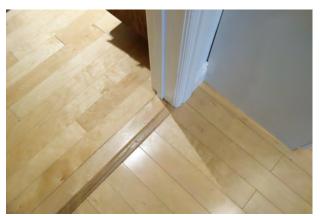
24 Ann Street - INTERIOR – MAIN FLOOR – laminate flooring
